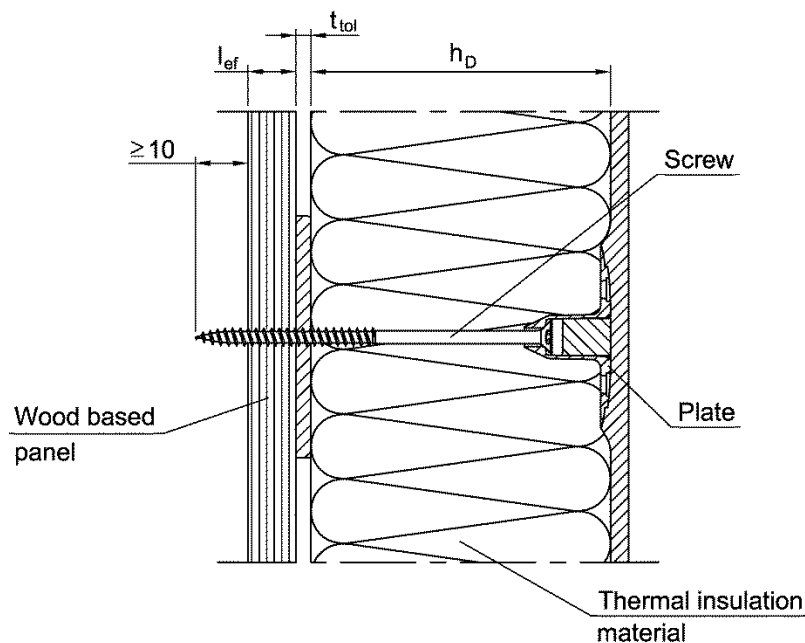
Example of the use of the fasteners – Substructure = Wood-based panel
